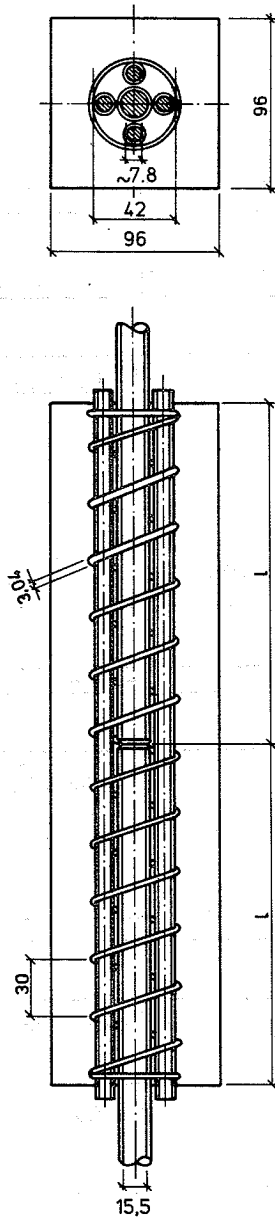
EF.-specimen dimensions and reinforcement arrangements.
